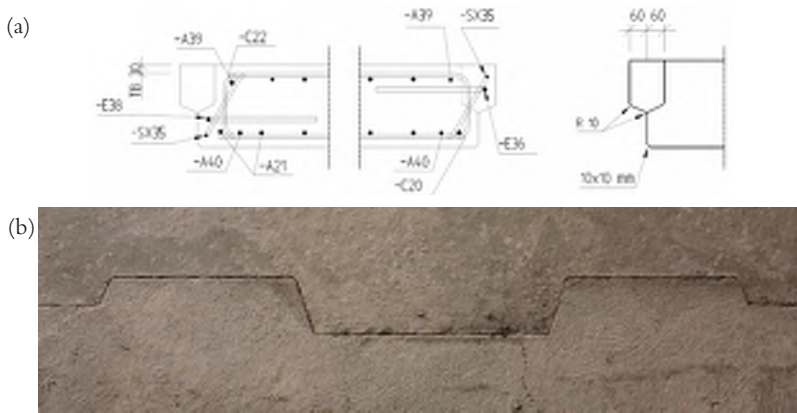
Tested type of shear key, (a) reinforcement and geometry, (b) photo of a dry joint
